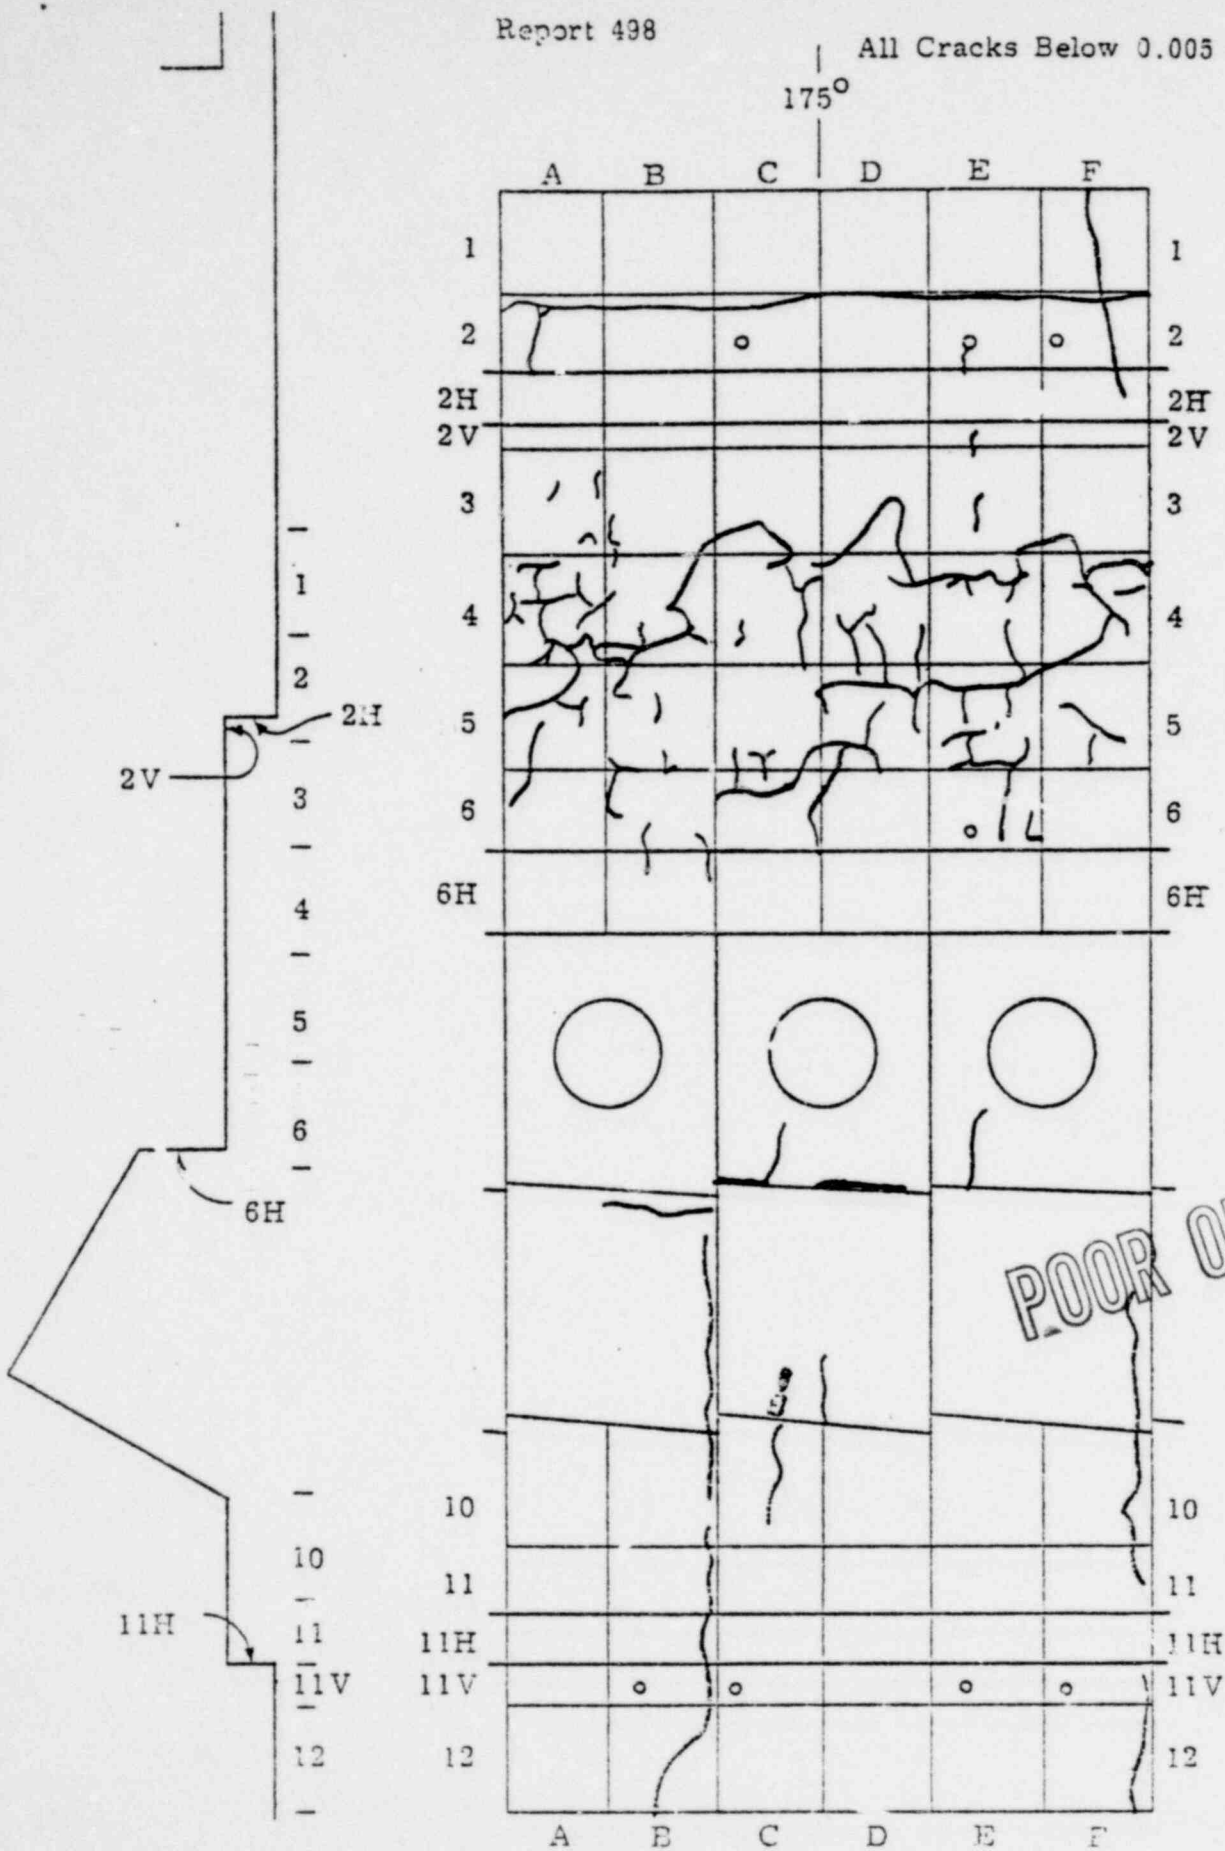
CRACK PATTERN AT AZIMUTH 175° AFTER FULL PRESTRESS, SEPTEMBER 18, 1973.
